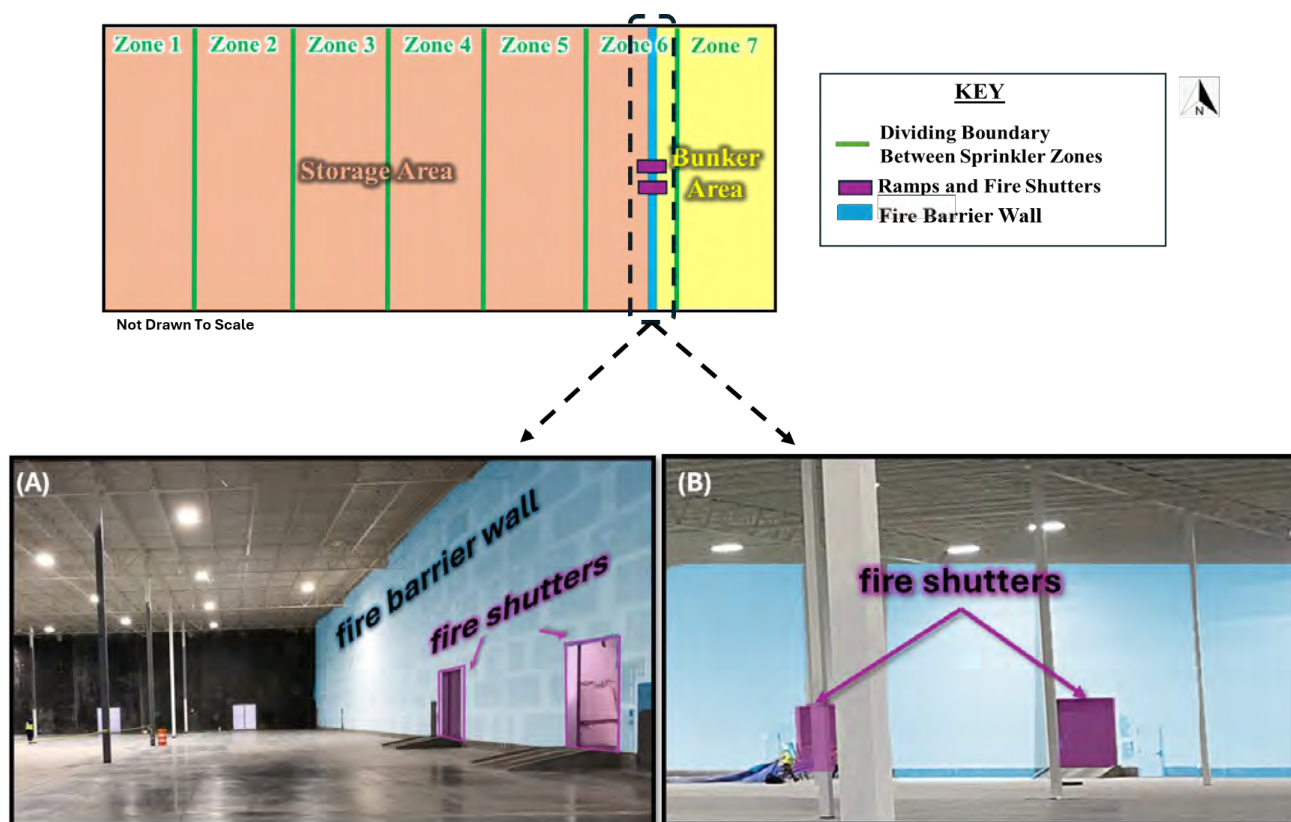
Plant 12 Storage Warehouse floor plan showing different views of the fire barrier wall location and fire shutters. (A) Northwest view of the warehouse showing the fire barrier wall (2-hour rated) and 90-minute fire shutters, and (B) Front view of the fire barrier wall and fire shutters. (Credit: ARCO, annotated by CSB)
